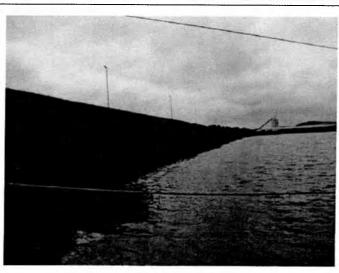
Outlet structure located near southeast corner of ash pond, photo facing north. Photo 20 Outlet structure located near southeast corner of ash pond. Photo 21 Vertical riser in the outlet pipe located beyond and downstream of the toe.
